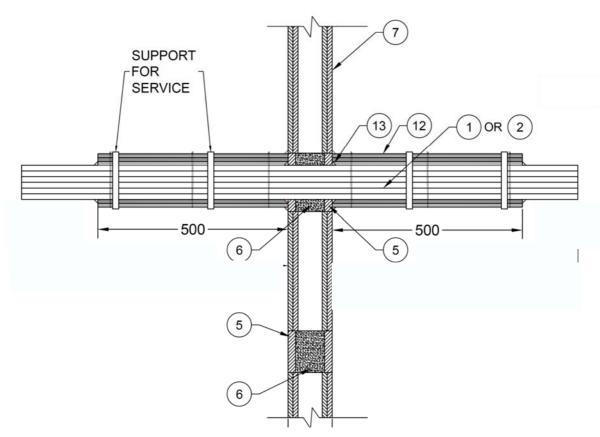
Typical details for Cables and Metal Pipes wrapped with Emat for plasterboard lined walls 150mm thick
